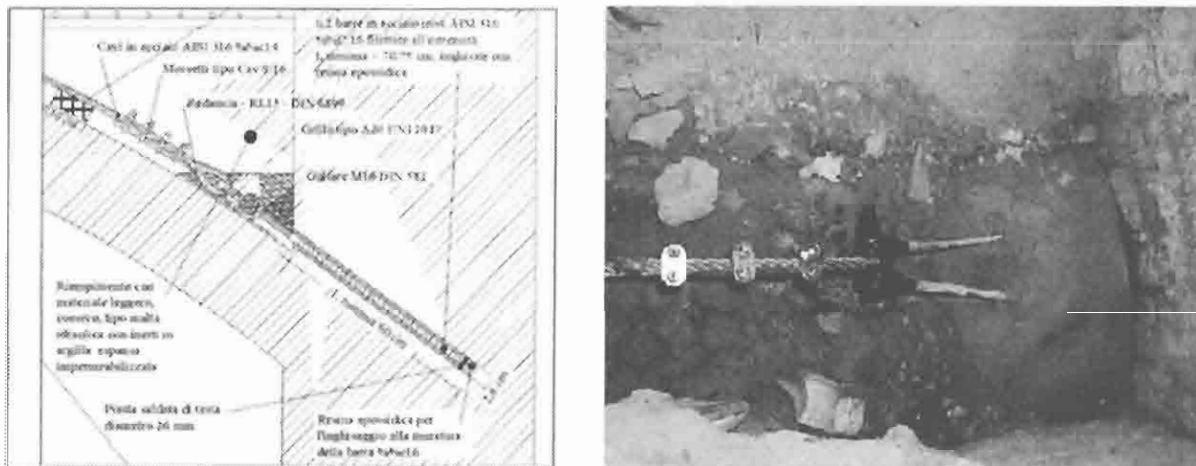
Detail and view of the stainless steel anchor to the masonry wall.
